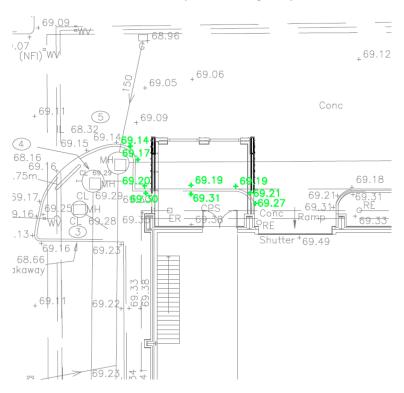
Extract of Topographical Survey and Site Layout Overlay: Northern Extension
